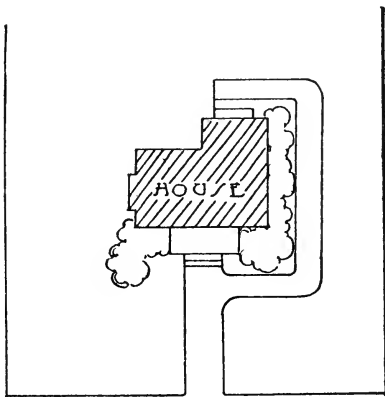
Where the path, or a branch of it, is carried around the house, leave room between it and the building for some foundation planting, if possible
